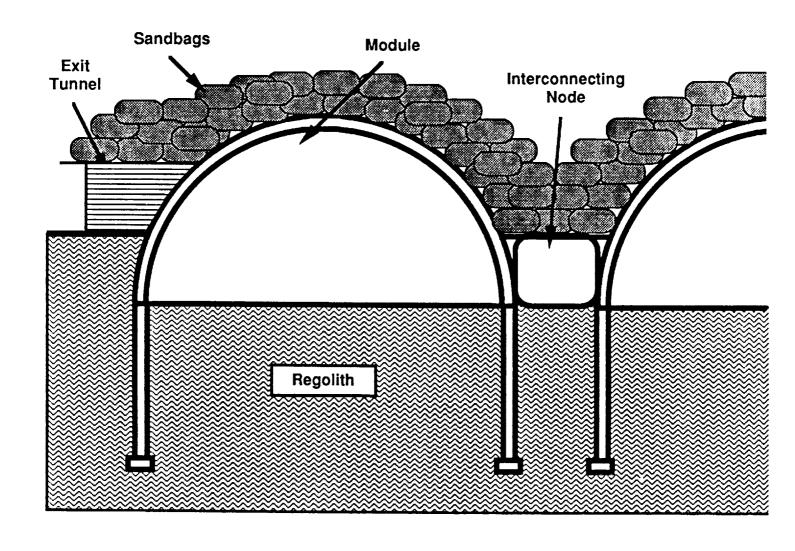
SIDE VIEW OF MODULE CONSTRUCTION
